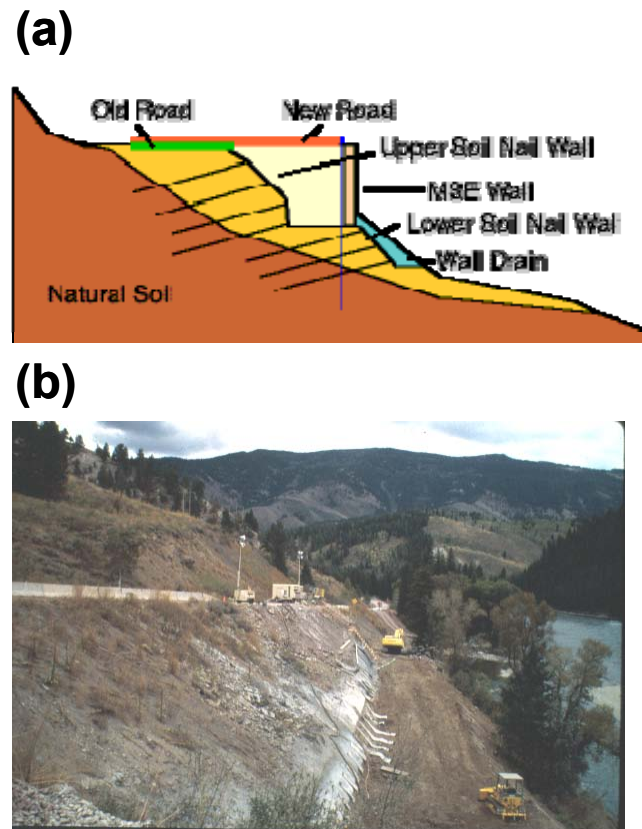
Snake River Canyon MSE wall, Wyoming: (a) Cross-section, (b) Construction of soil nail stabilized slope (stable face) behind new MSE retaining wall (Turner, 2005)
